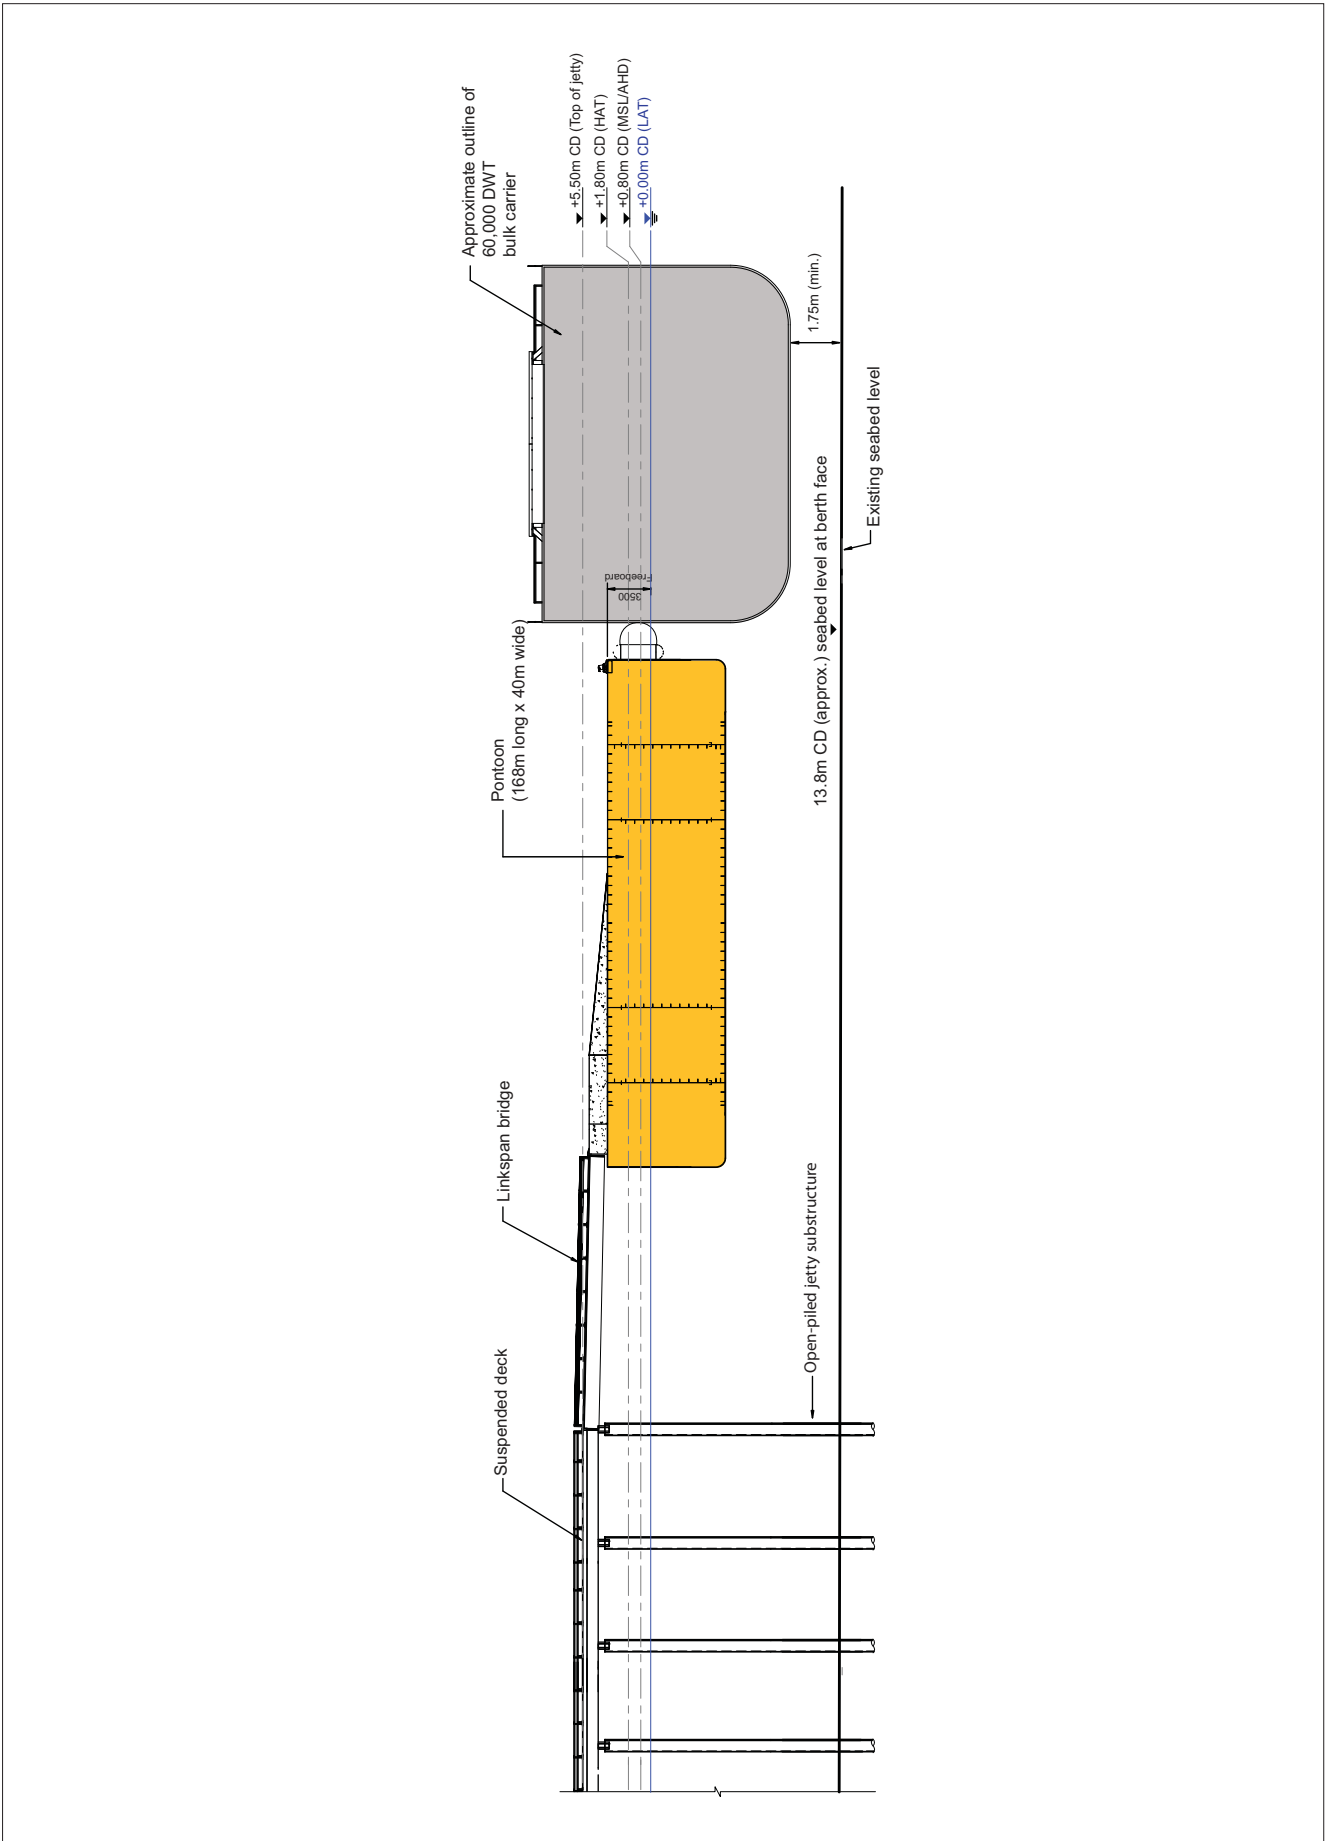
CONCEPTUAL DESIGN SHOWING SUSPENDED PILED JETTY AND LINKSPAN BRIDGE TO A PONTOON AND SHIP
